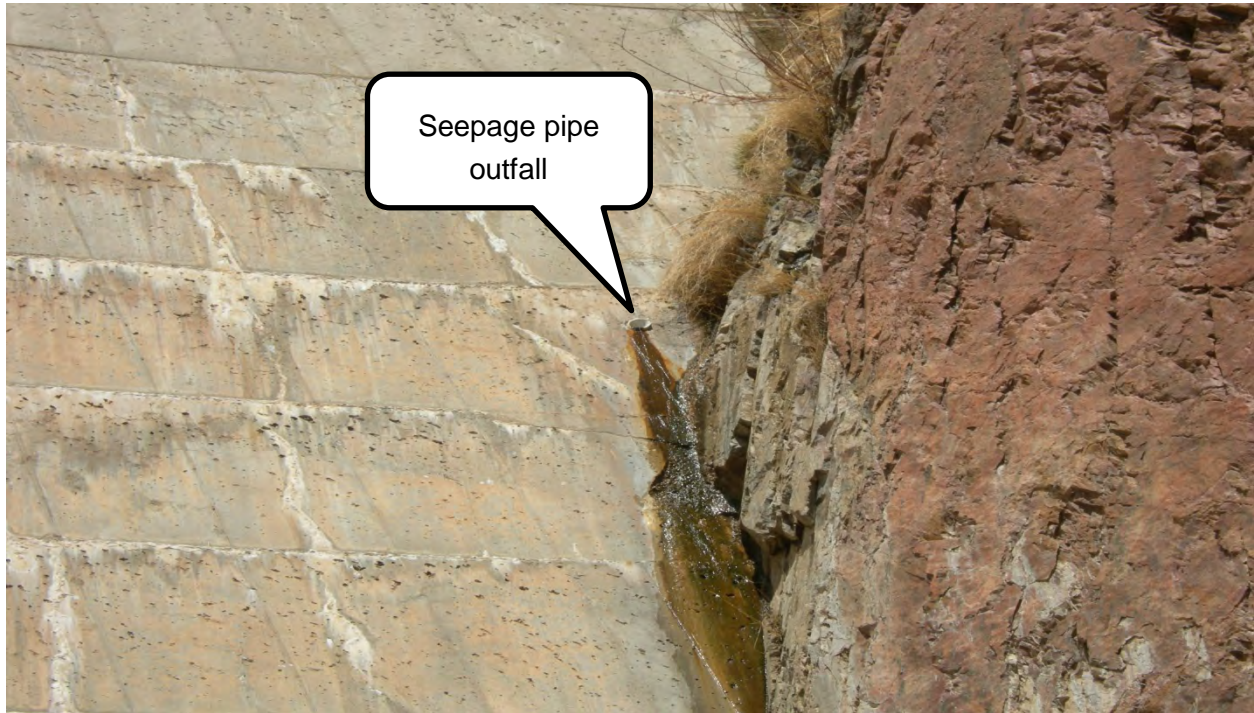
Internal seepage pipe in left abutment about mid way up the face of the dam. Regularly releasing water. (May 6, 2013)
